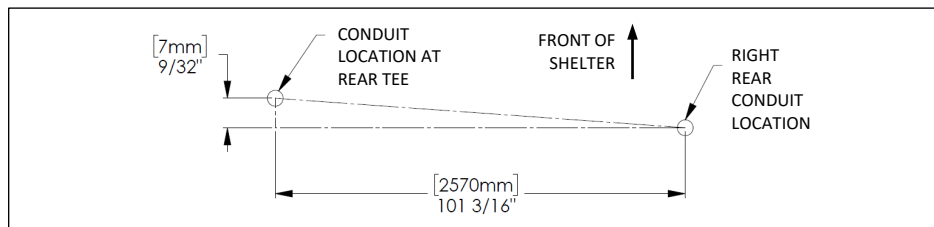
PLAN VIEW OF CONDUIT LOCATIONS
